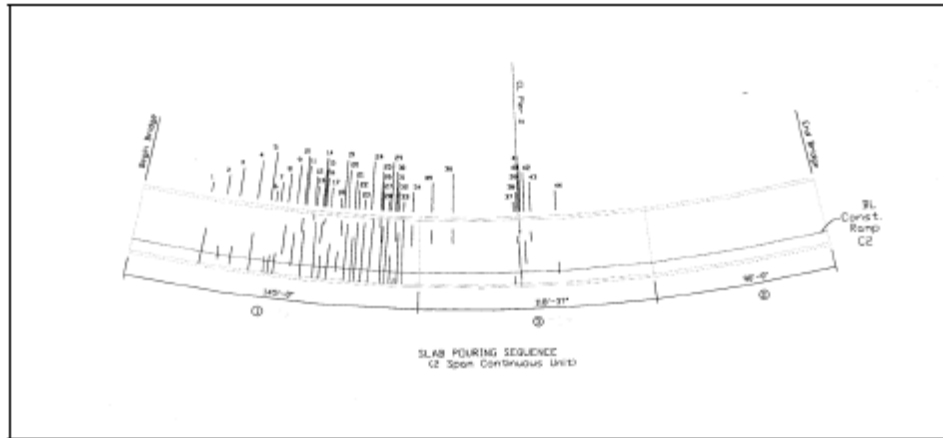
Full Sections of Bridge 704 and its Cracking Pattern
